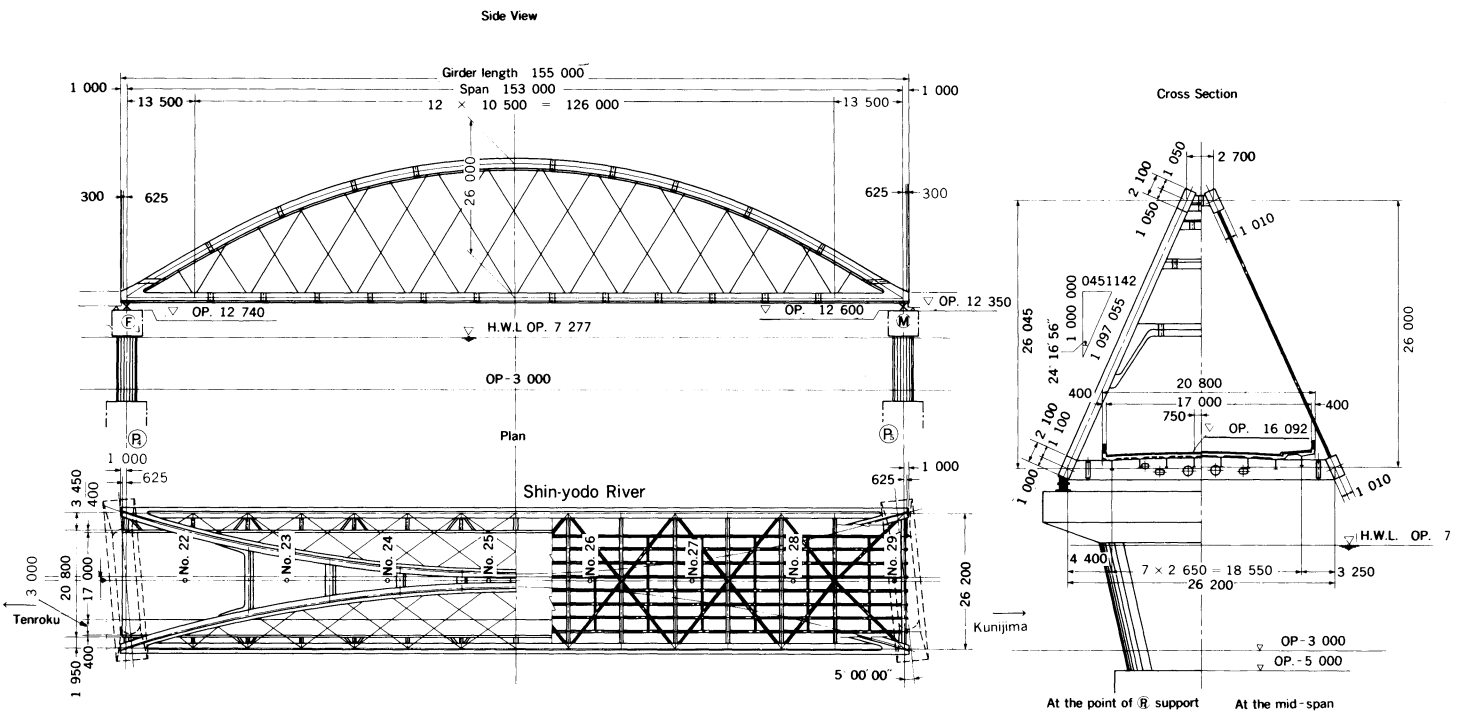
Elevation and plan of the Nielsen type Lohse bridge
